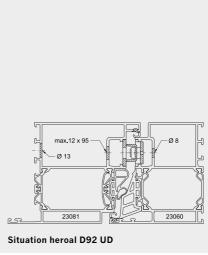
Routing dimensions for STV-KÜ-T1 FT and cover plate F24 (dimensions in mm)
